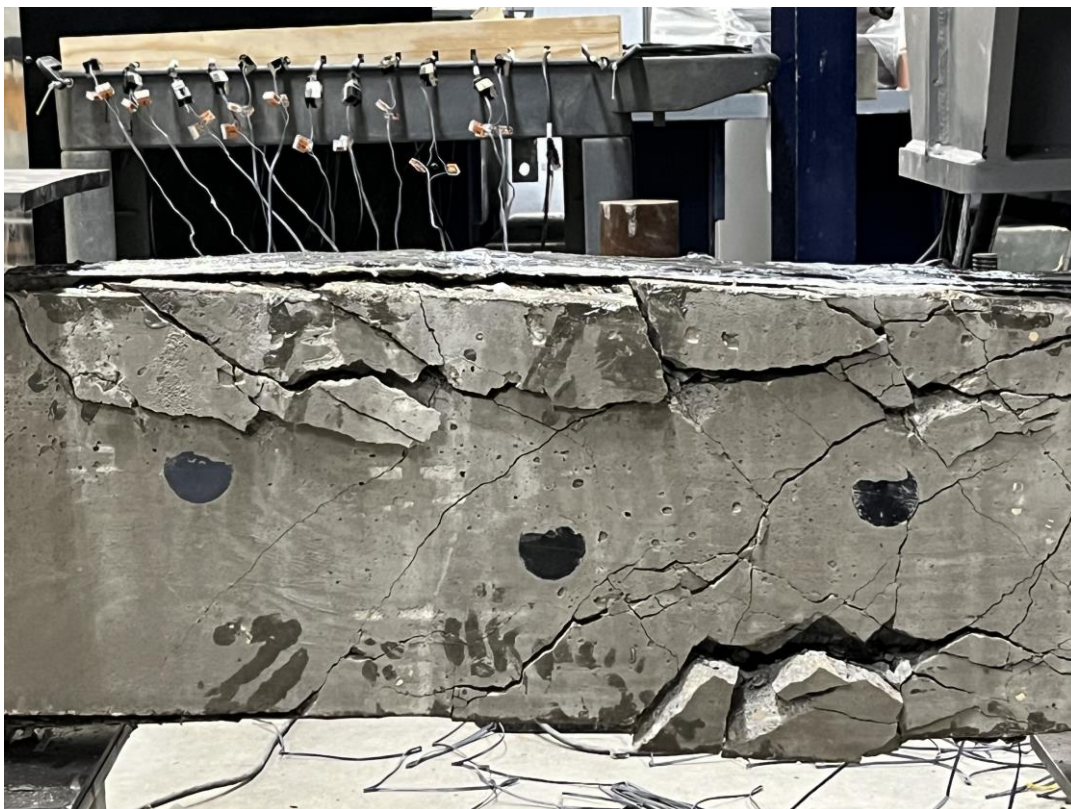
Formulation of concrete cover delamination and shear cracks of beam No.15 during testing
